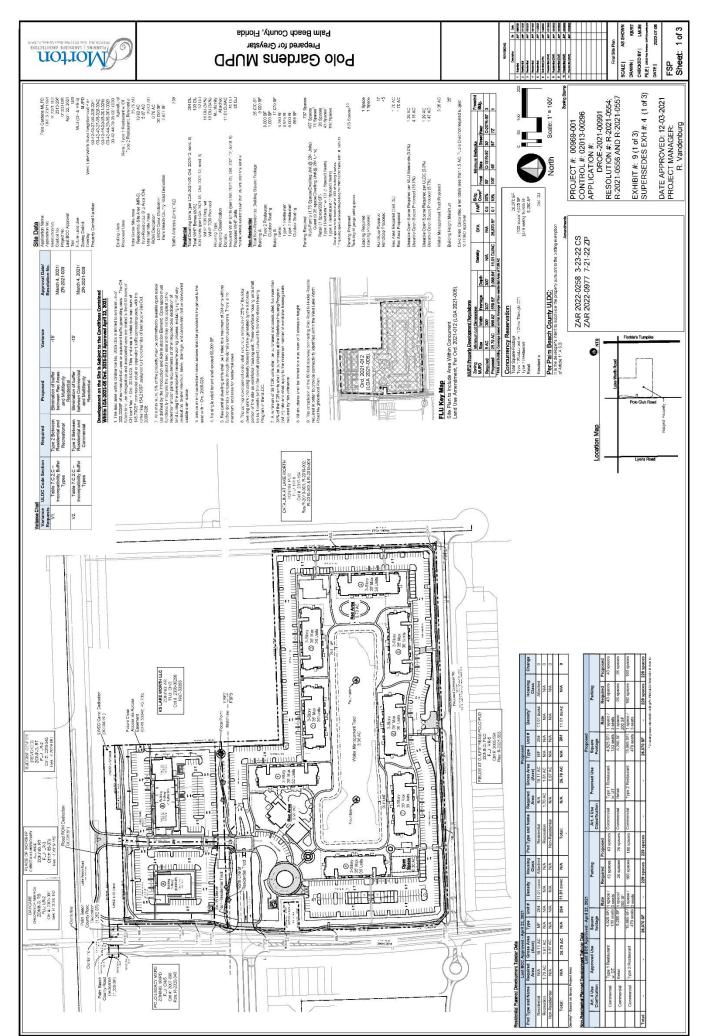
Approved Site Plan Dated December 3, 2021 (Page 1 of 3)
